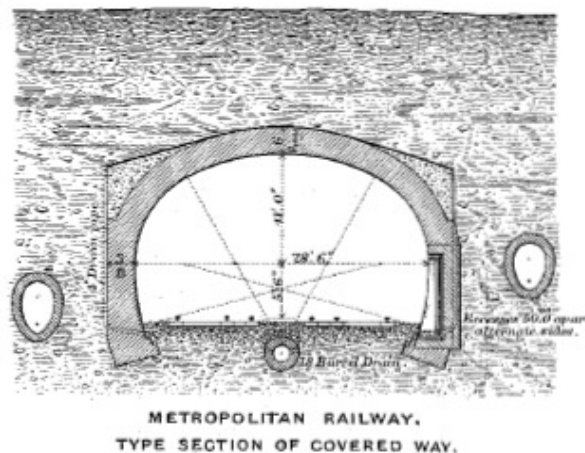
Drawing showing assumed foundation construction (note this does not show the second tunnel or Lighthouse building over)
